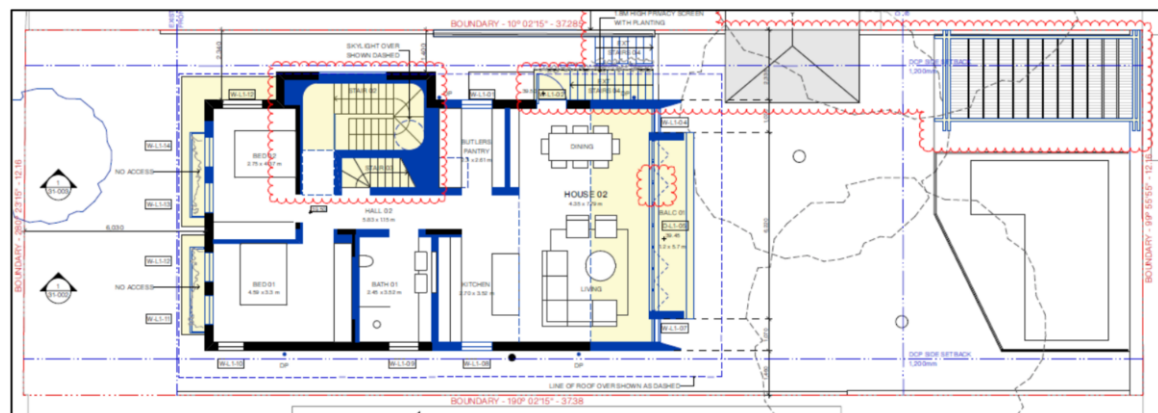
First floor plan - 10 Moore Street (Source: Tribe Studios)
